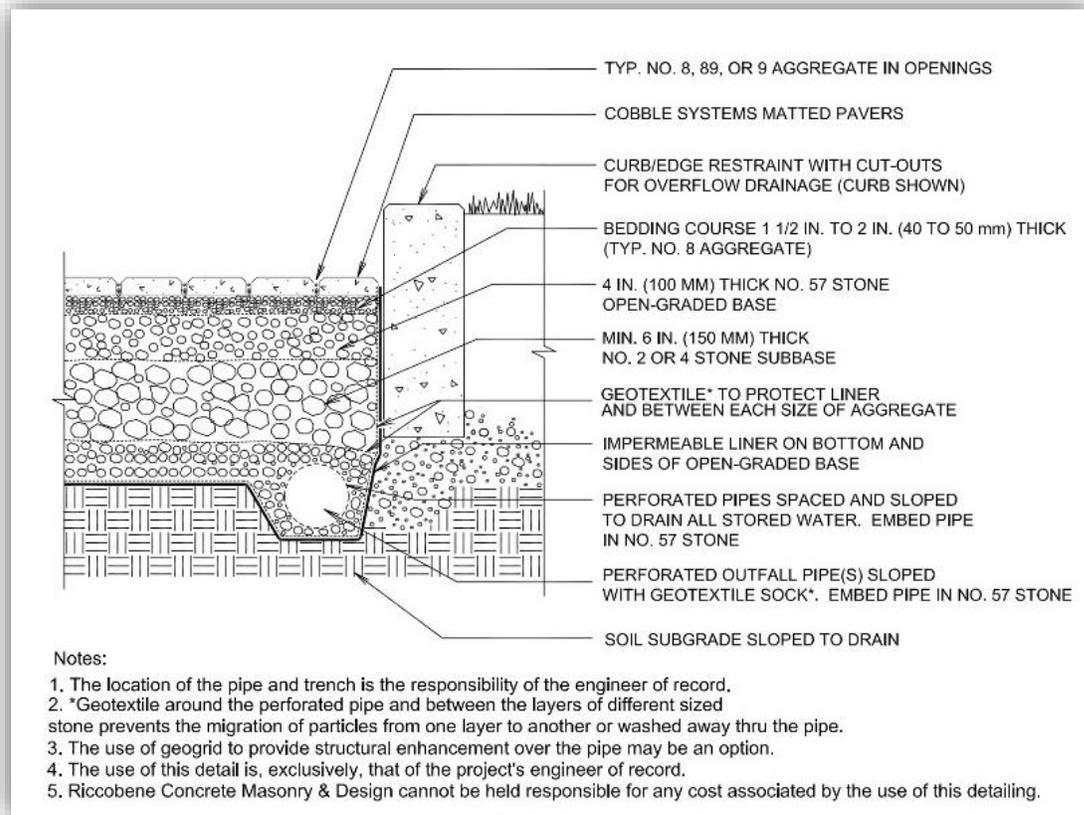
Typical permeable pavement with no exfiltration to soil subgrade.
